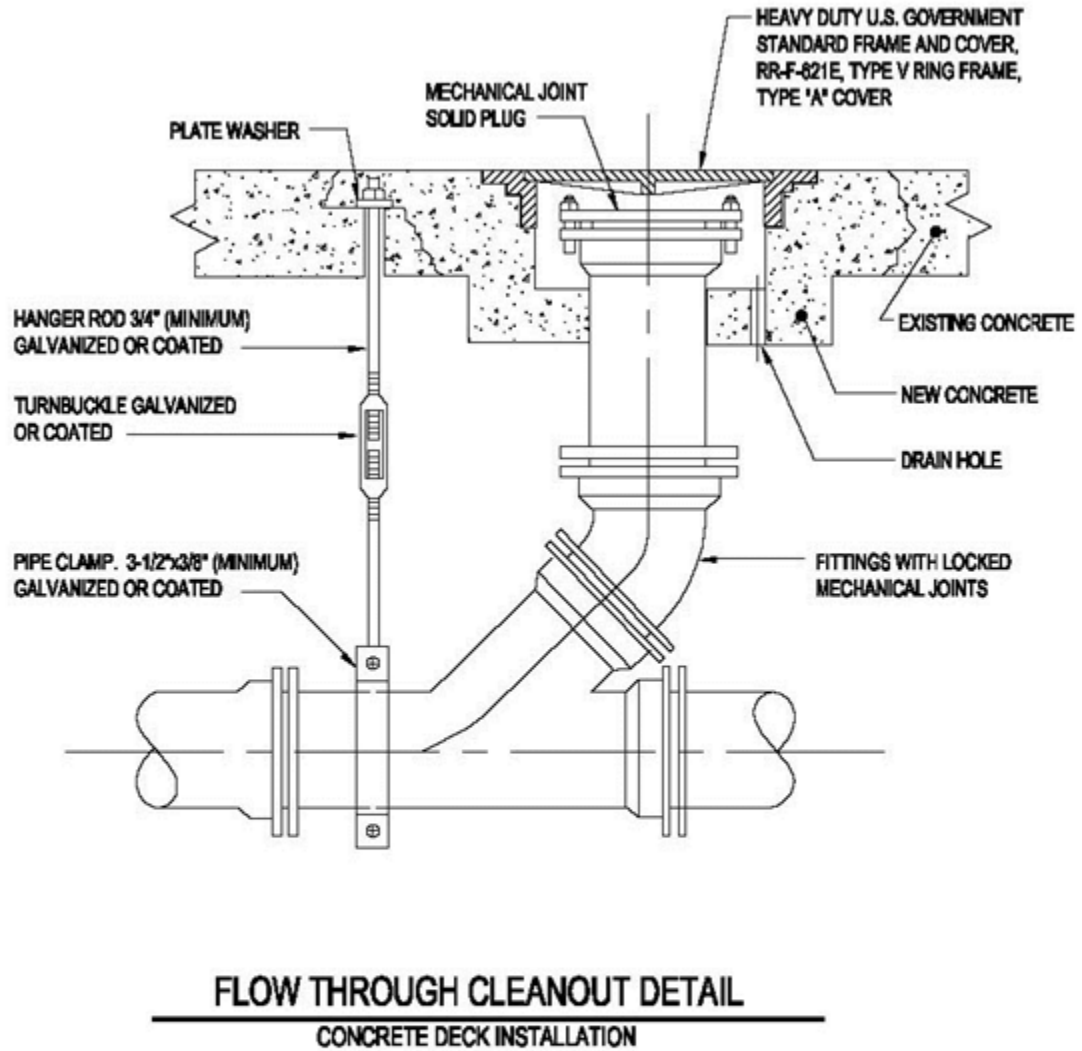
(b) Details of Sewage Collection Facilities (2 of 2)
